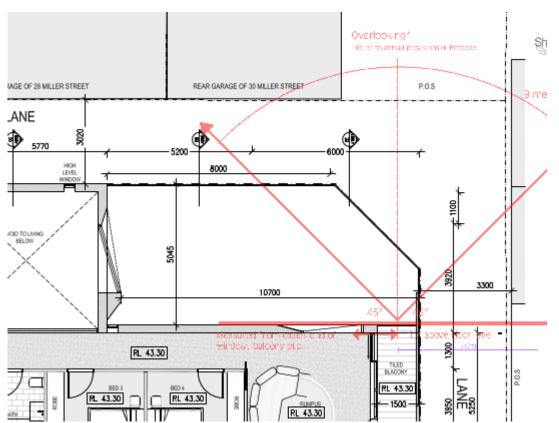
potential overlooking from the north of the first floor balcony to the adjacent SPOS of the dwelling to the north.
